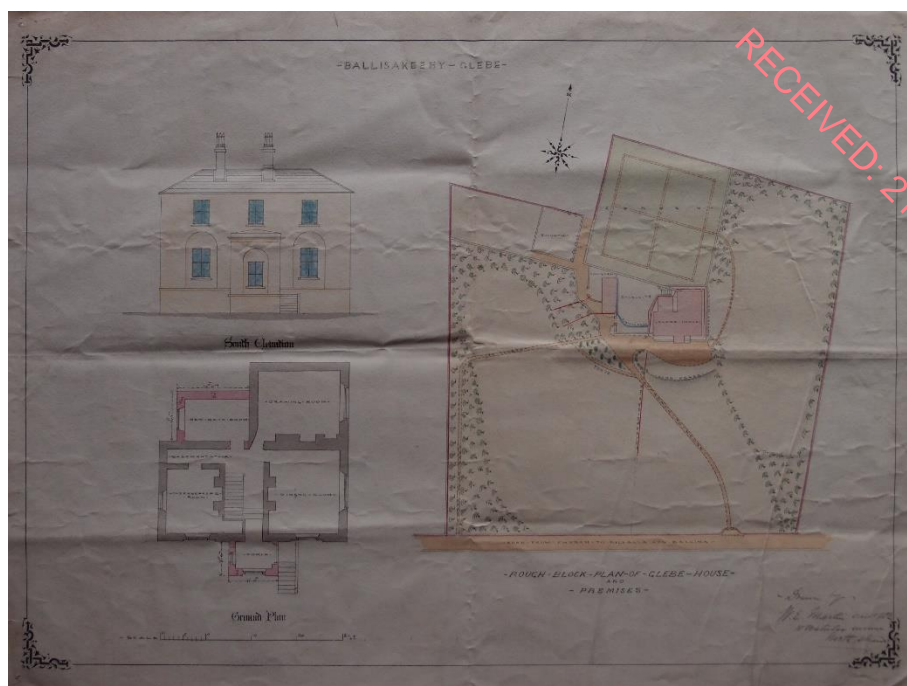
A drawing signed by William Edward Martin (1843-1915) of 10 Waterloo Avenue, North Strand, Dublin, showing a *ROUGH BLOCK PLAN OF GLEBE HOUSE and PREMISES* and the *South Elevation* and *Ground Plan* with proposals for the addition of a porch and new bathroom. Courtesy of the Representative Church Body Library (i_gh01800101)
